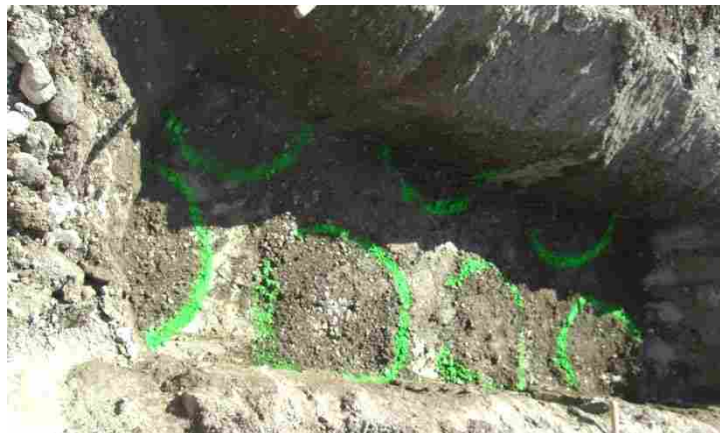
Photo of finished excavation with the RAP columns highlighted
